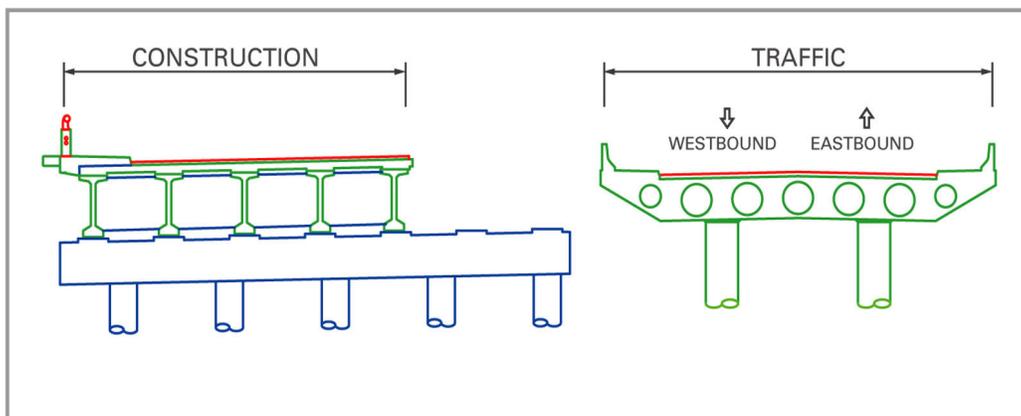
Stage One - Construction of North Portion of Proposed Bridge
